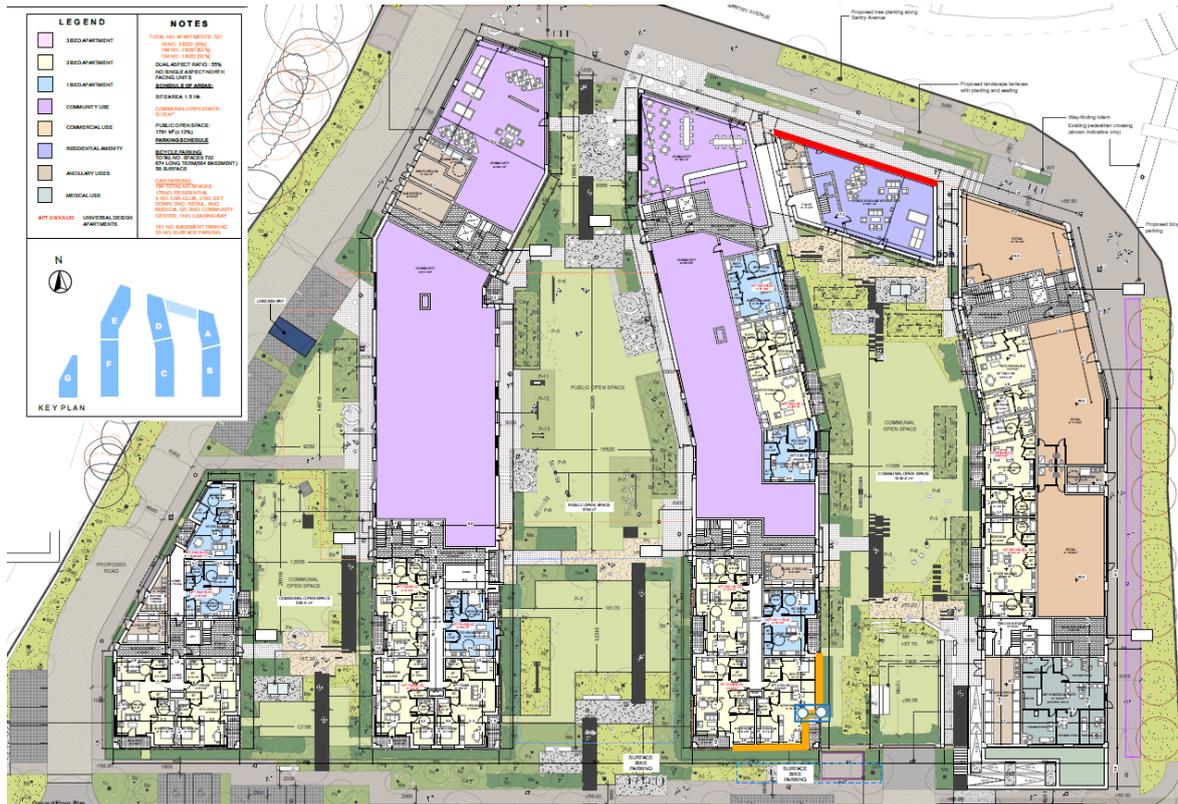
Façade Acoustic Requirements – Ground Floor
